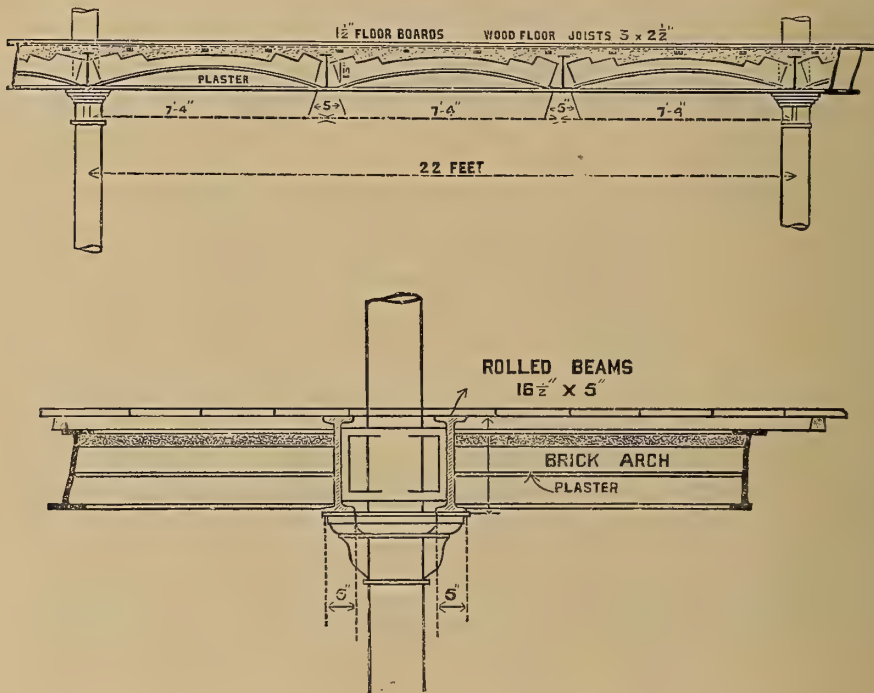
CEILING WITH STEEL DOUBLE MAIN GIRDERS, STEEL CROSS BEAMS, AND BRICK ARCHES.
